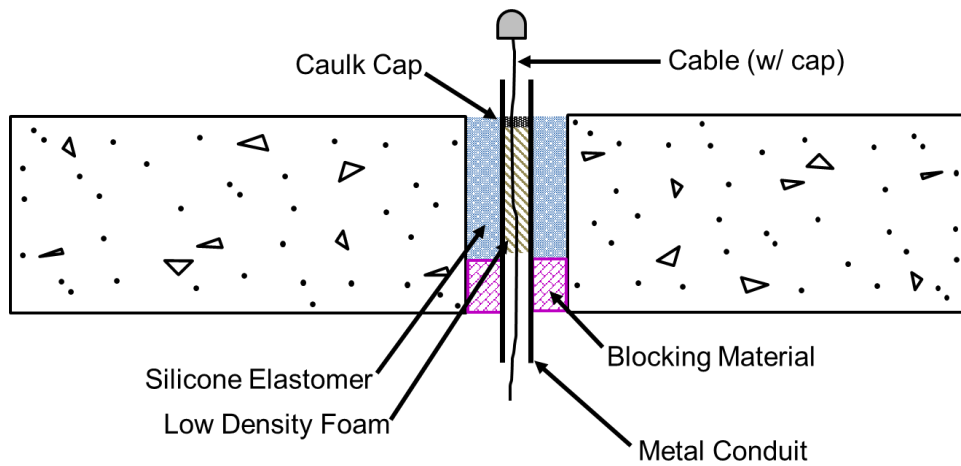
Test Deck Cross Section with Silicone Elastomer Seal
